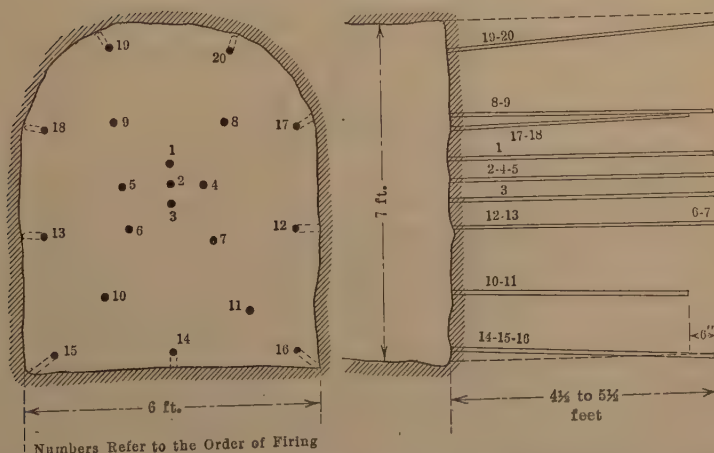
ARRANGEMENT OF HOLES FOR DRIFTING—ROUND OF 20 HOLES.
